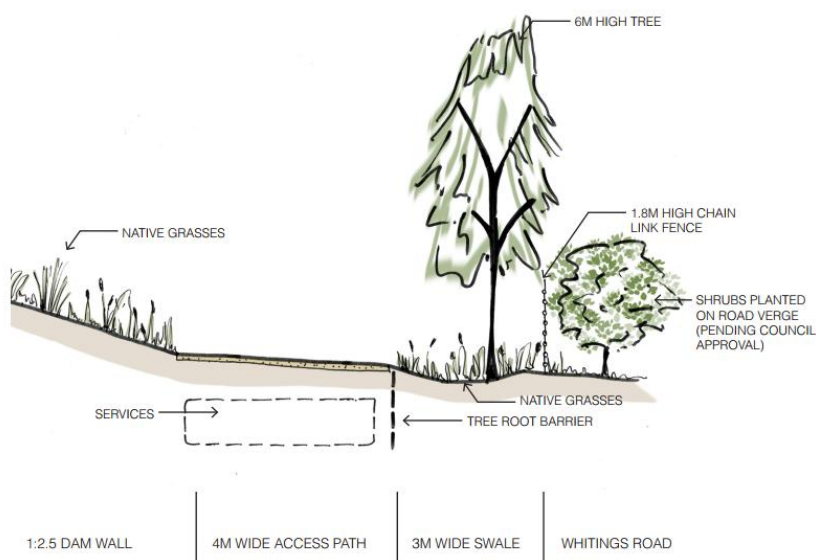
Whittings Road Cross Section (Source: Wax Design Report)
